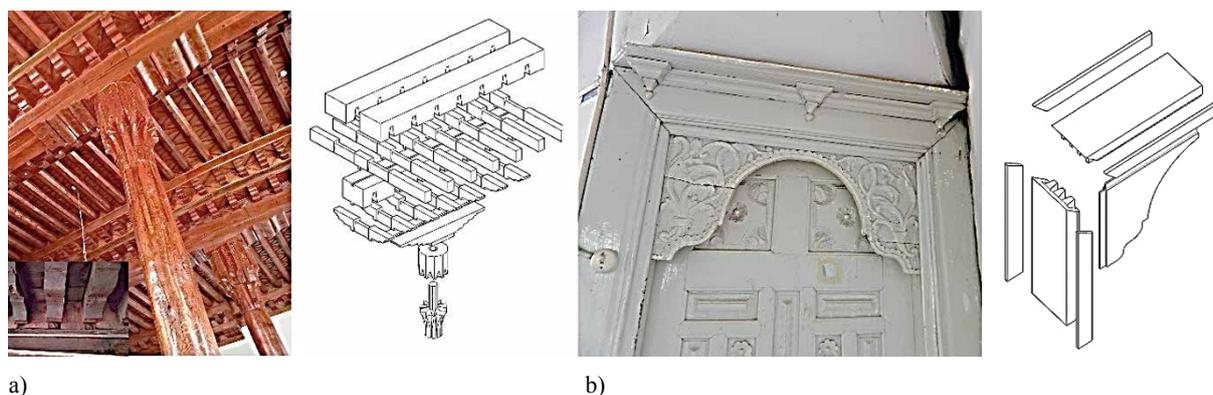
a) Photo and detail of “Çantı” technique in a traditional Turkish wooden hypostyle mosque; Ulucami in Ayaş-Ankara b) Photo and detail of a wooden corner of a door frame in a traditional Turkish house; Kızılcaaböyük – Denizli
